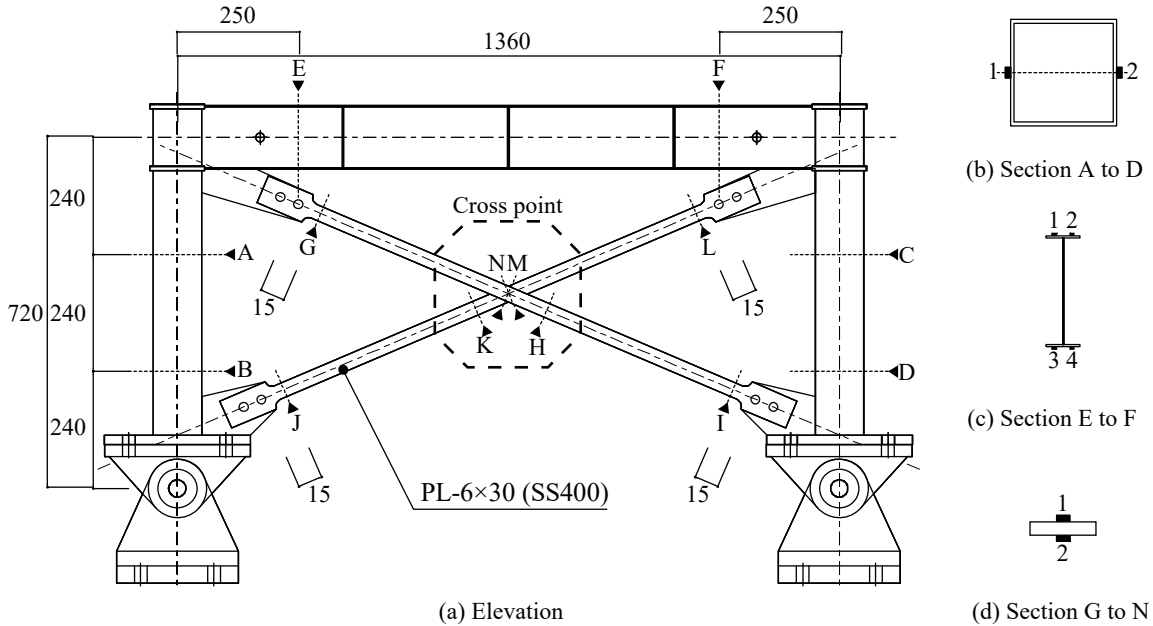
Specimen drawing including strain gauge places (Flat plate, unit: mm)
